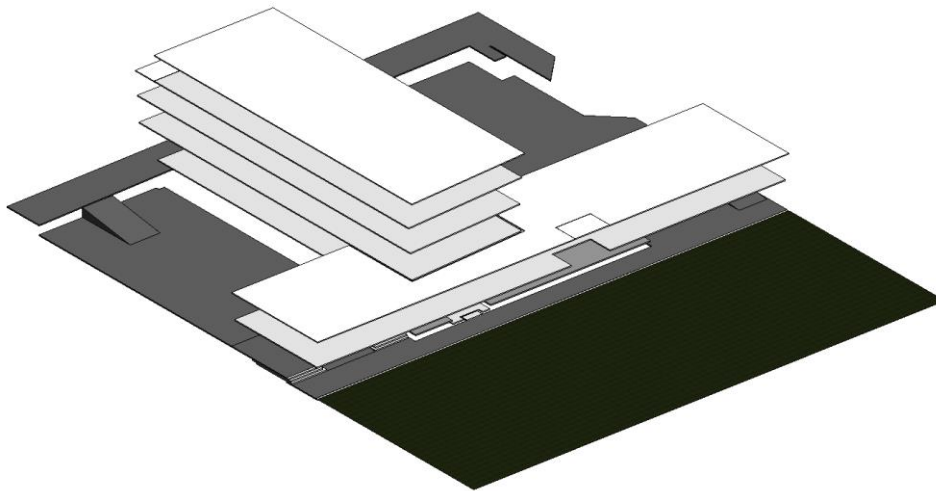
Topography, Roofs and Floors in Revit model
